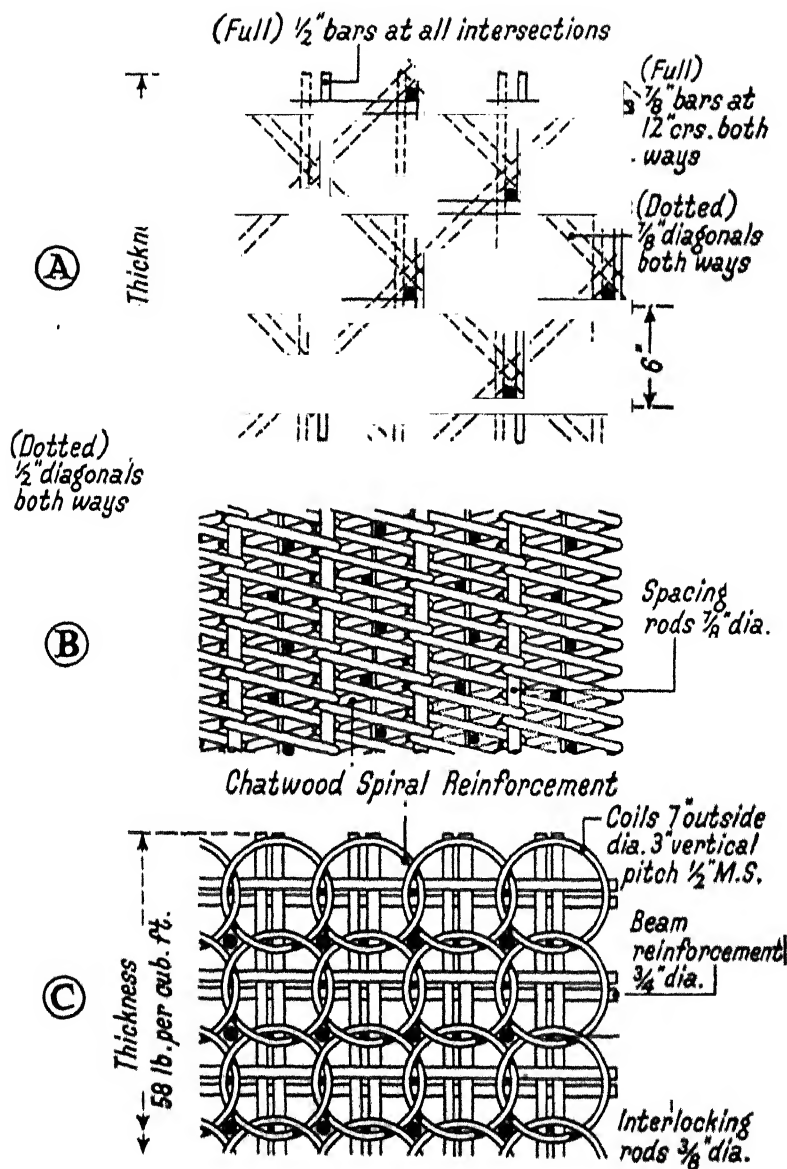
Showing alternative arrangements of special reinforcement in concrete shelters.
